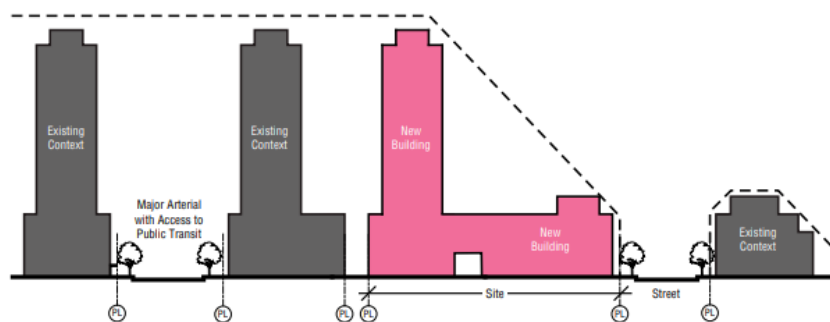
A conceptual illustration of an angular plane and direct relationship in base building height and form to support tall building transition down to a lower-scale area.
